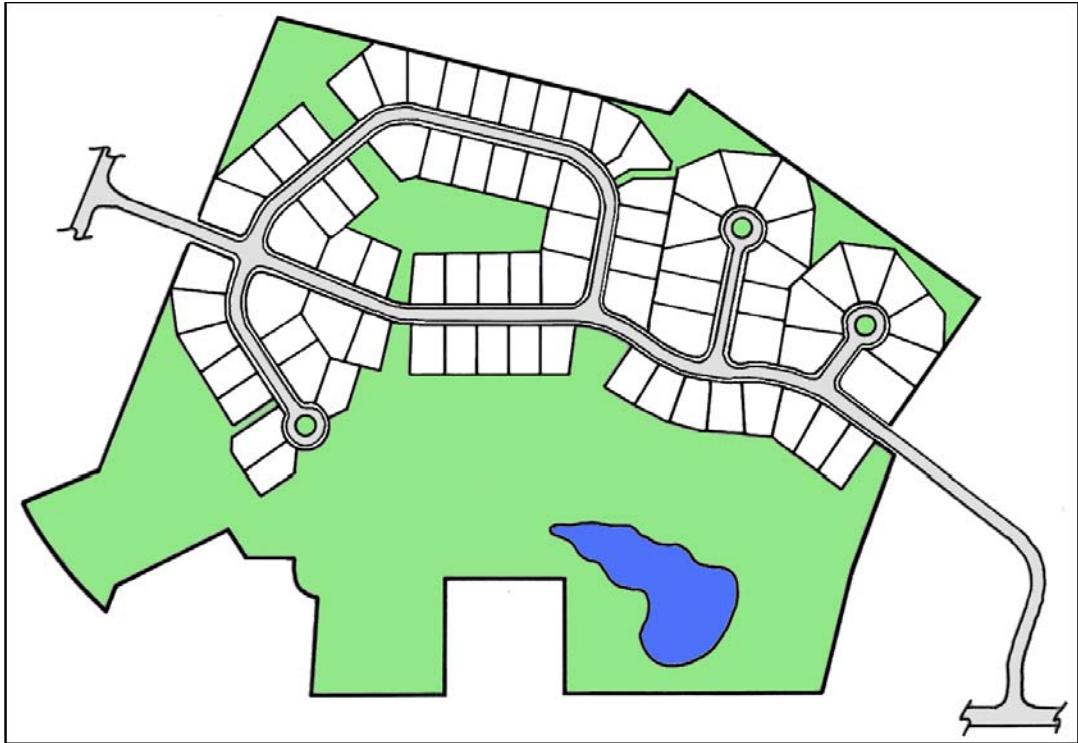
Open Space Subdivision Site Design Example
